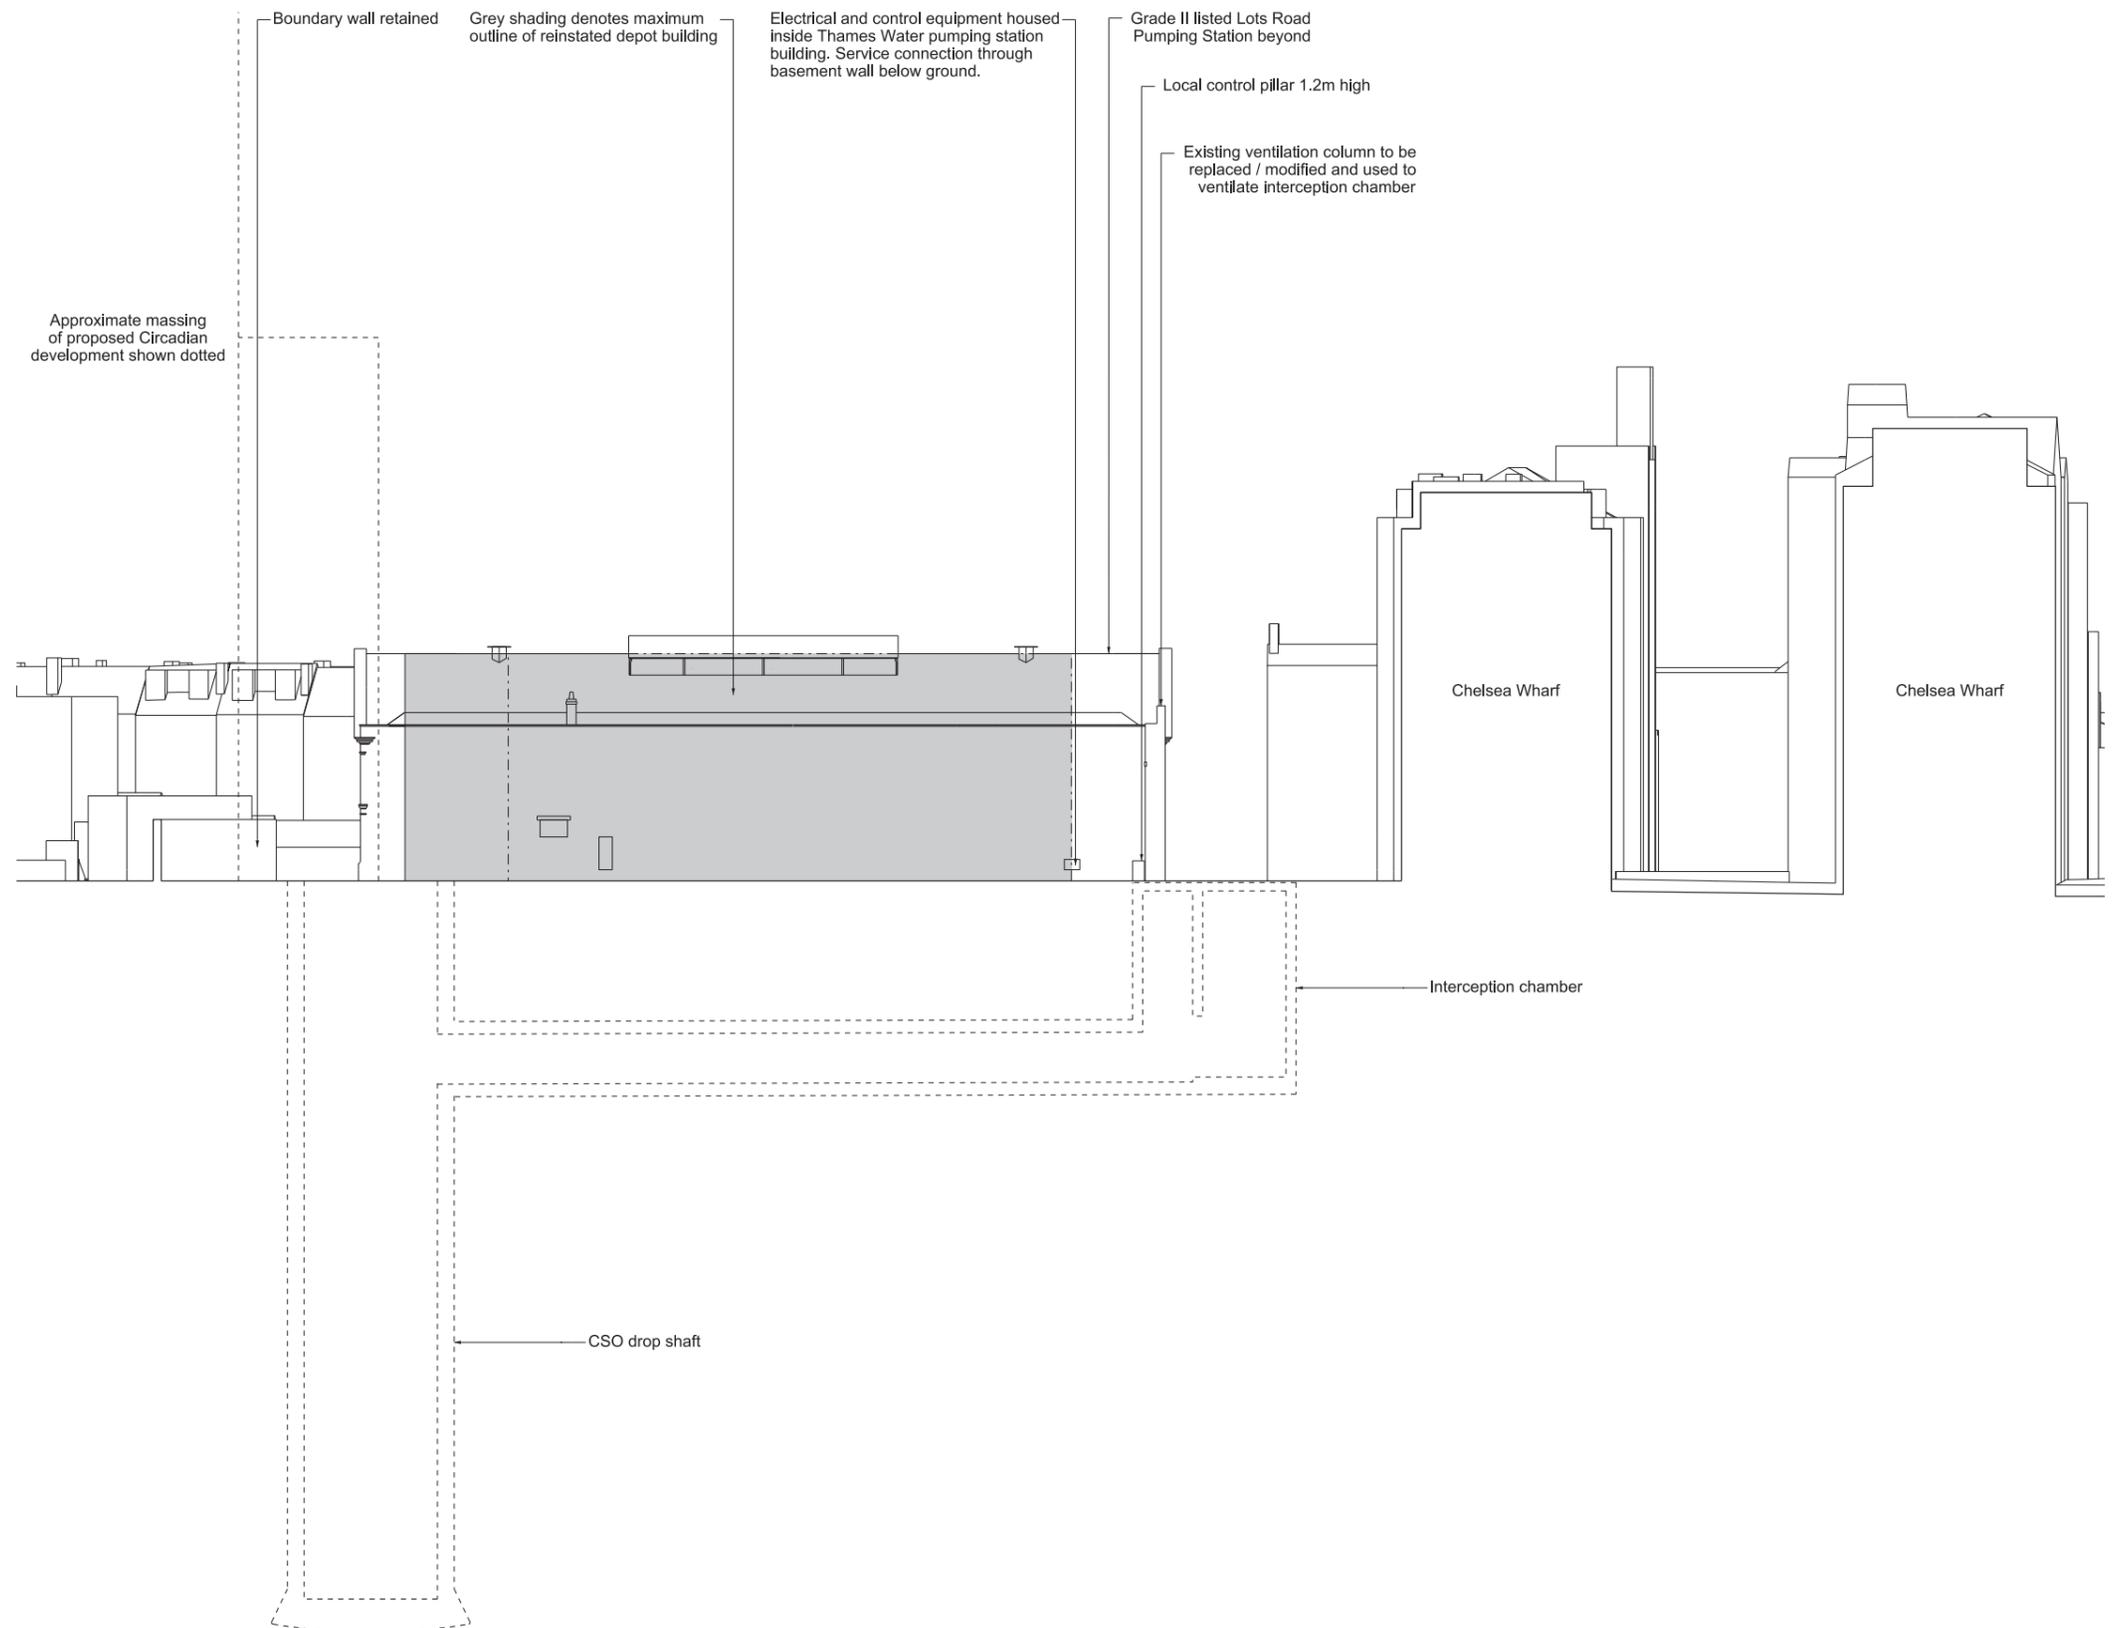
Proposed section through Cremorne Wharf depot building (not to scale) - refer to Section AA in the *Book of Plans
